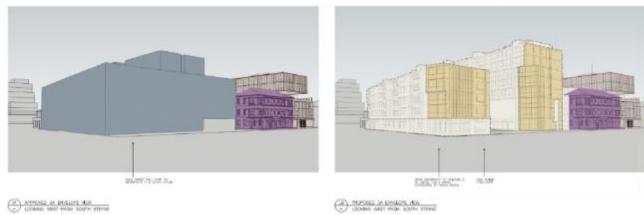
Building envelope and massing redistribution diagram (plan extract S75W – 1080)
